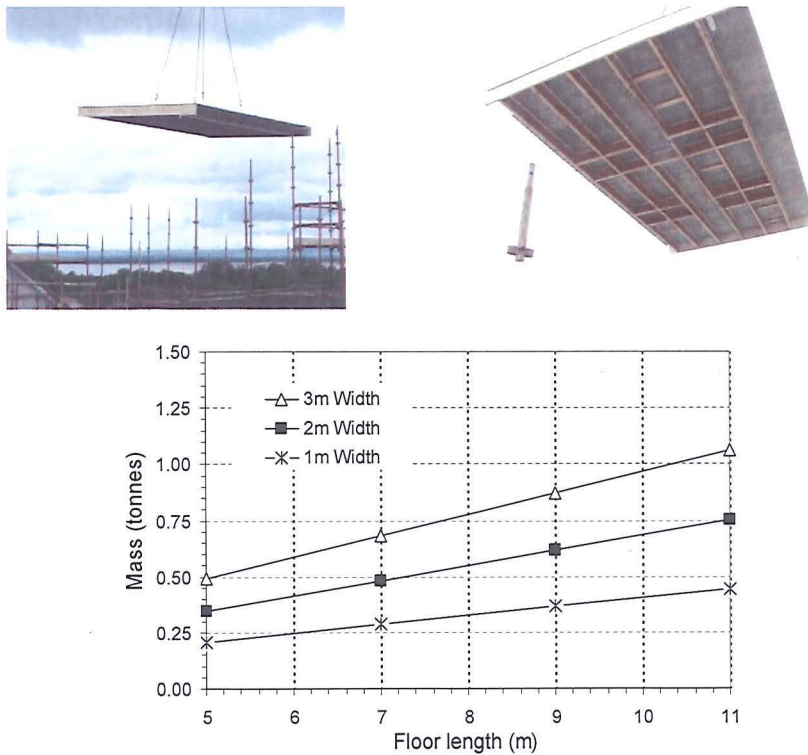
Cassette floor mass plot and examples of cassette floor lifting operations
